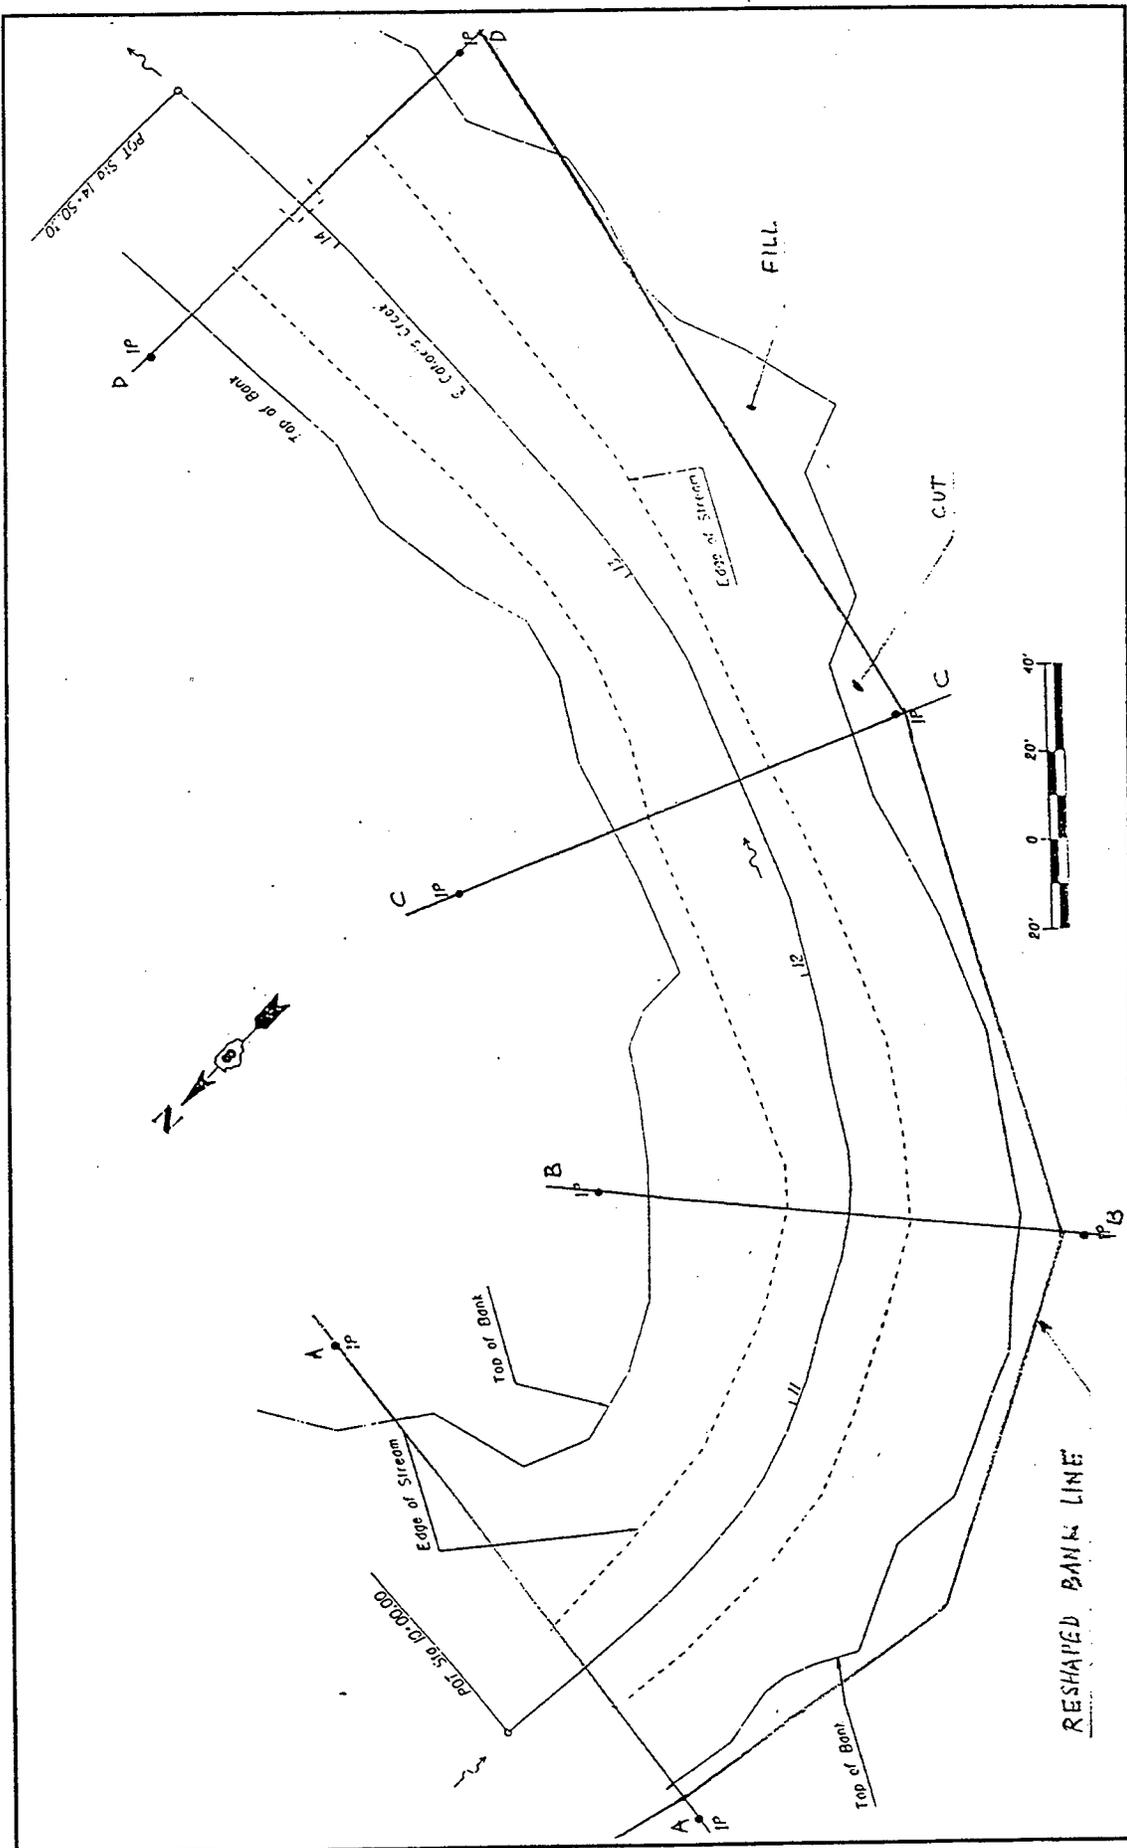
Cahokia Creek site alternative 1 design schematic (plan view).
